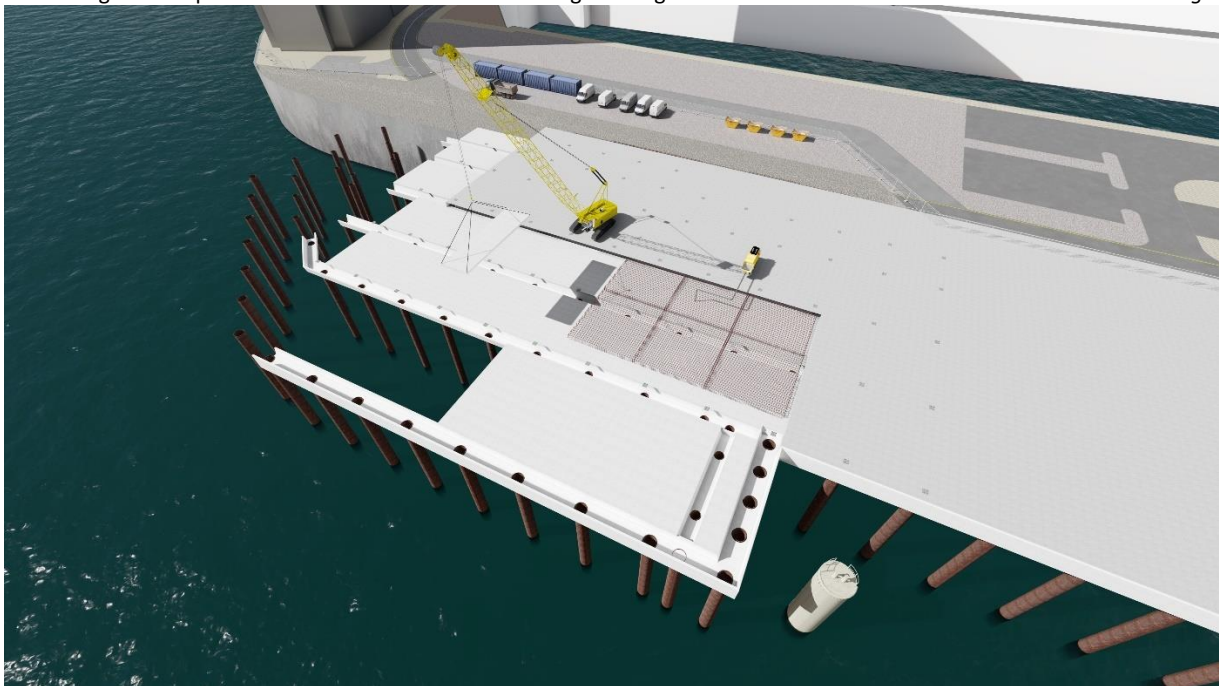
Piling Complete and precast and insitu works reaching the northern end of the site
